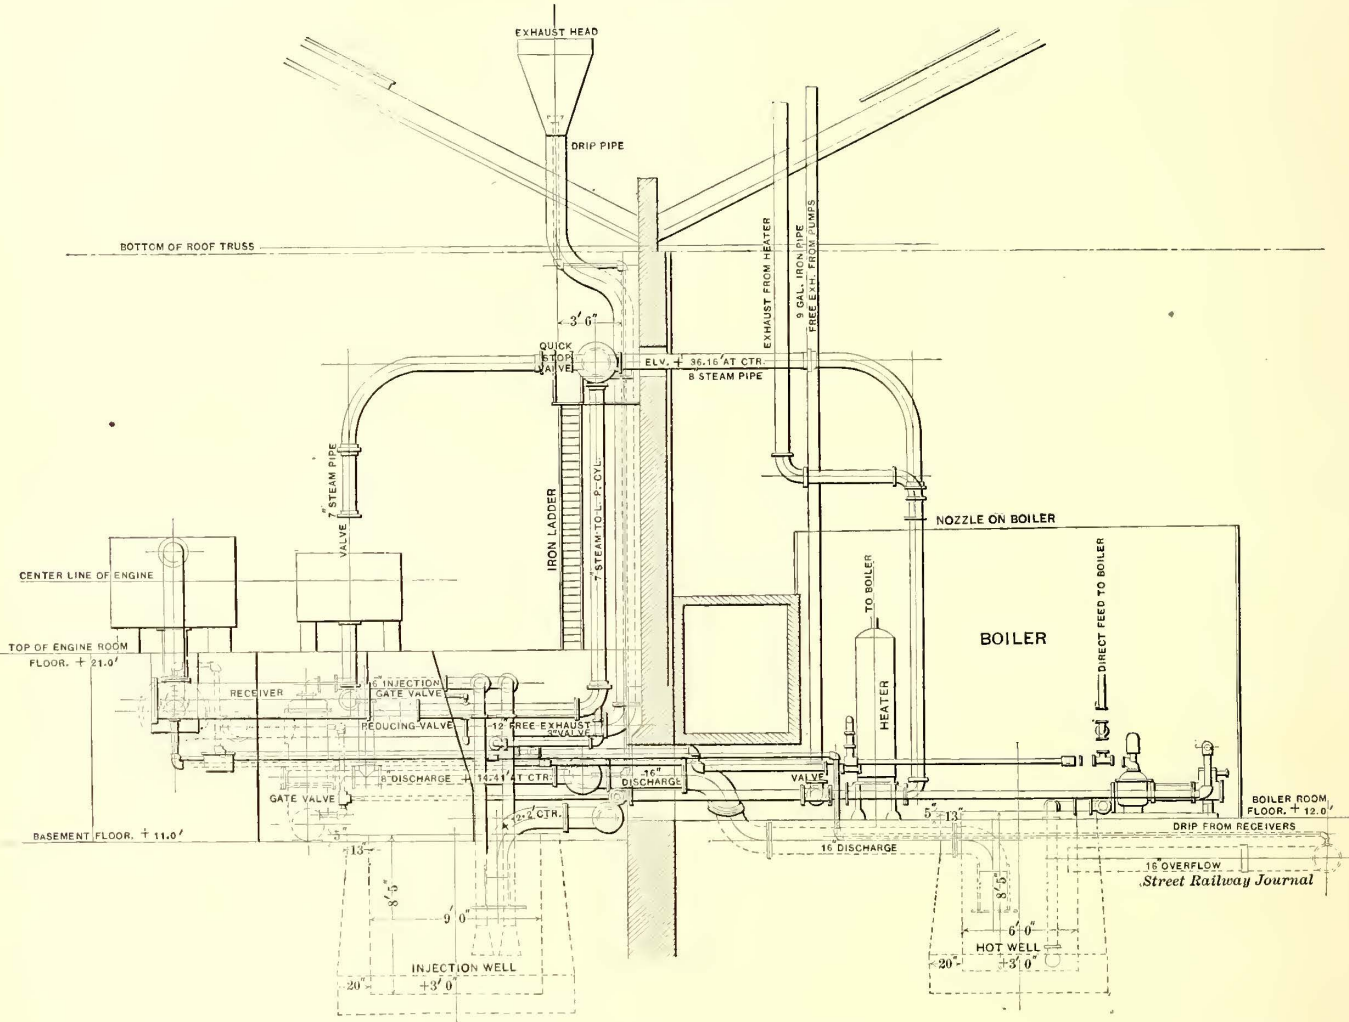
SECTION OF ENGINE AND BOILER ROOM, SHOWING PIPING—HESTONVILLE, MANTUA & FAIRMOUNT PASSENGER RAILWAY CO.
